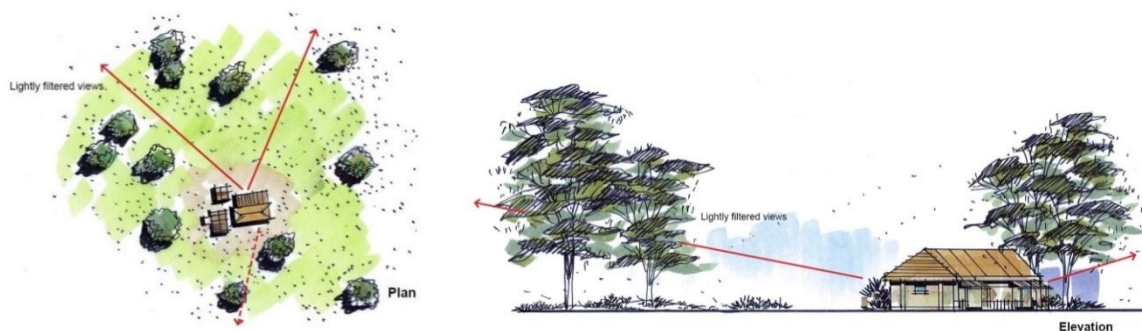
Typology 1 – Minimally screened. Typical plan and elevation.
